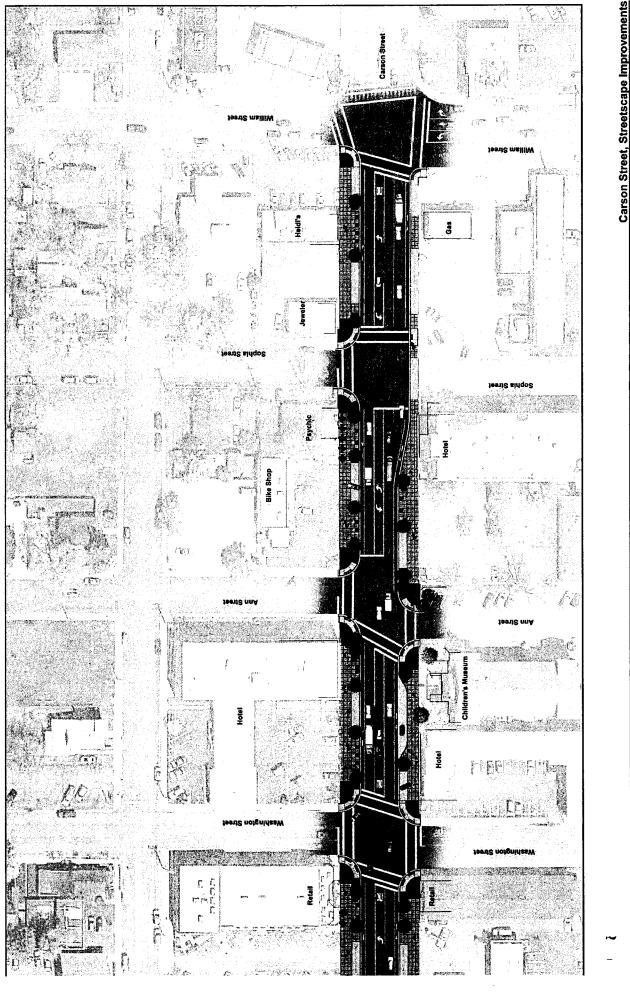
Exhibit B - Downtown Improvement Plan Sheet 2 of 4
